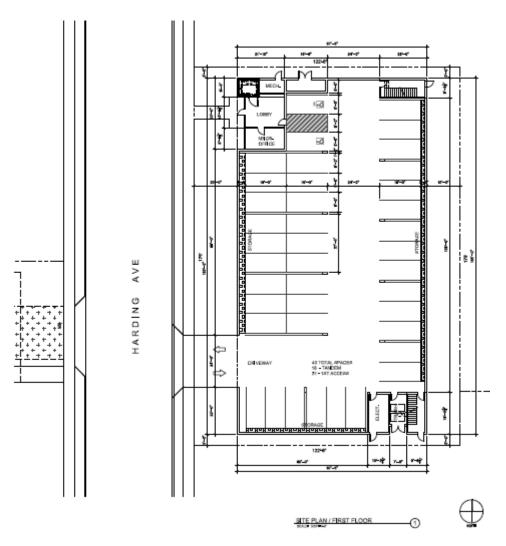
SITE PLAN FOR PHASE 2 (HARDING AVE.) SOURCE: John Cotton Architects, Inc.
